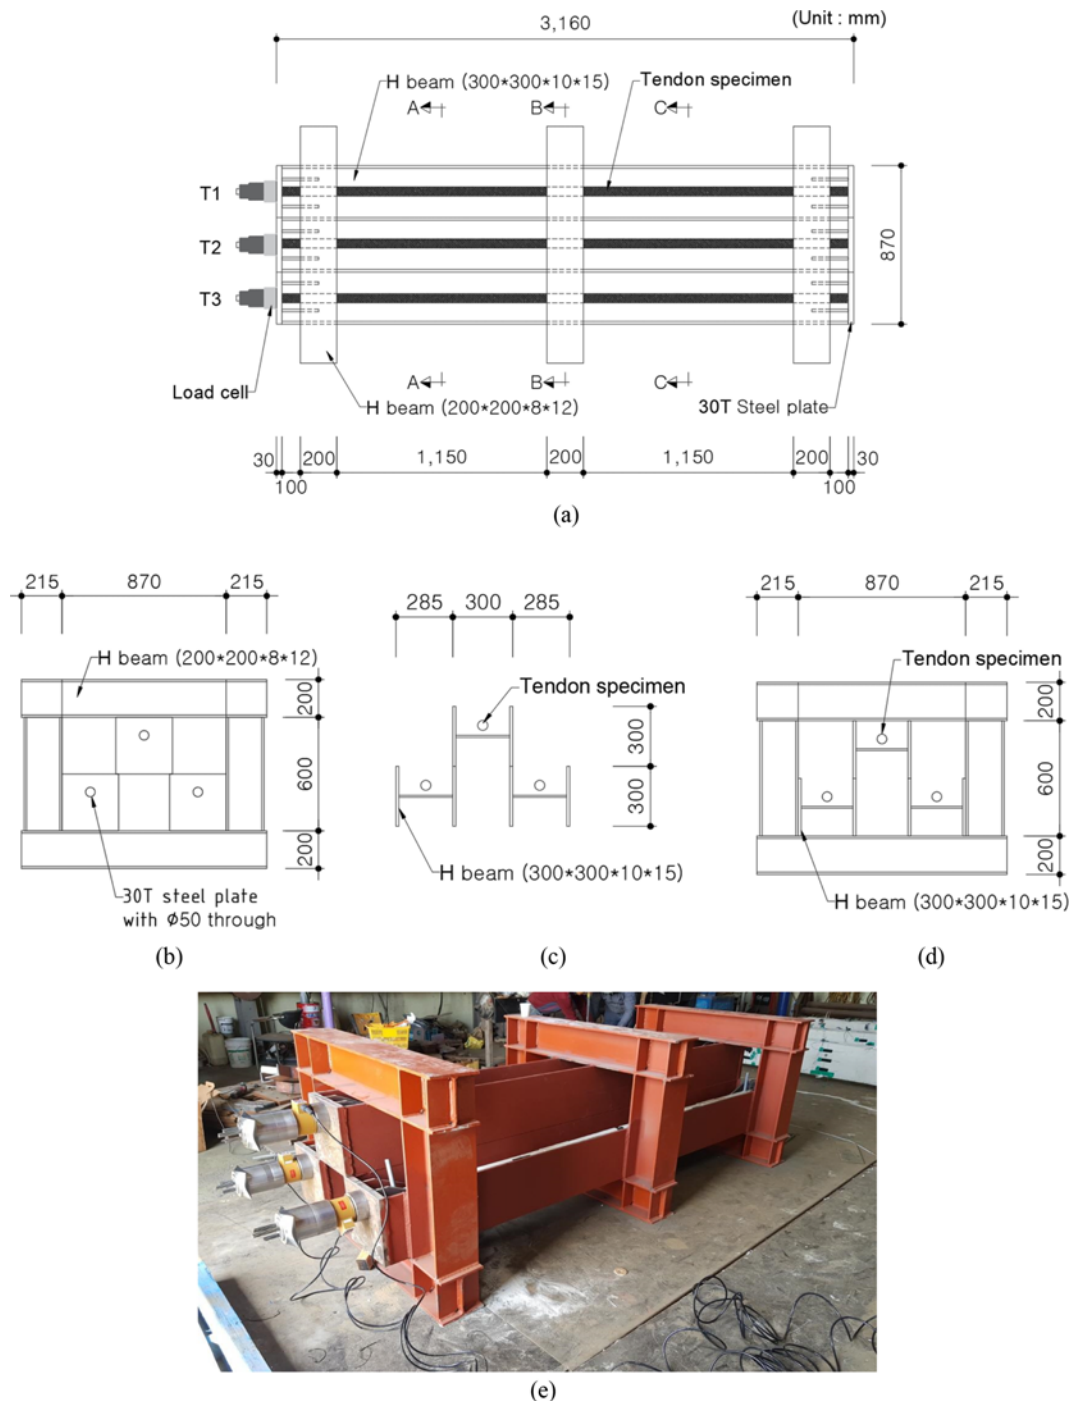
Reaction Frame for the Test: (a) Plan View, (b) Front View, (c) Sections A & C, (d) Section B, (e) Manufactured Reaction Frame
